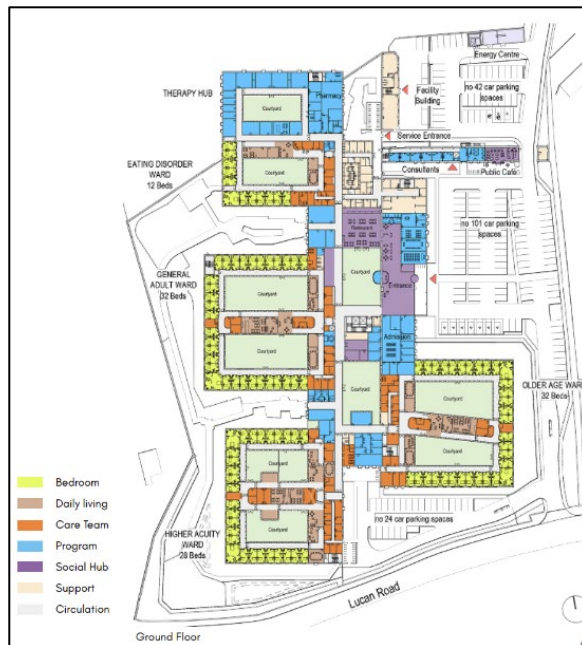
Image of the ground floor level of the proposed 200 No. bed hospital development (Source: Architectural Design Statement - TOT Architects, 2026).
